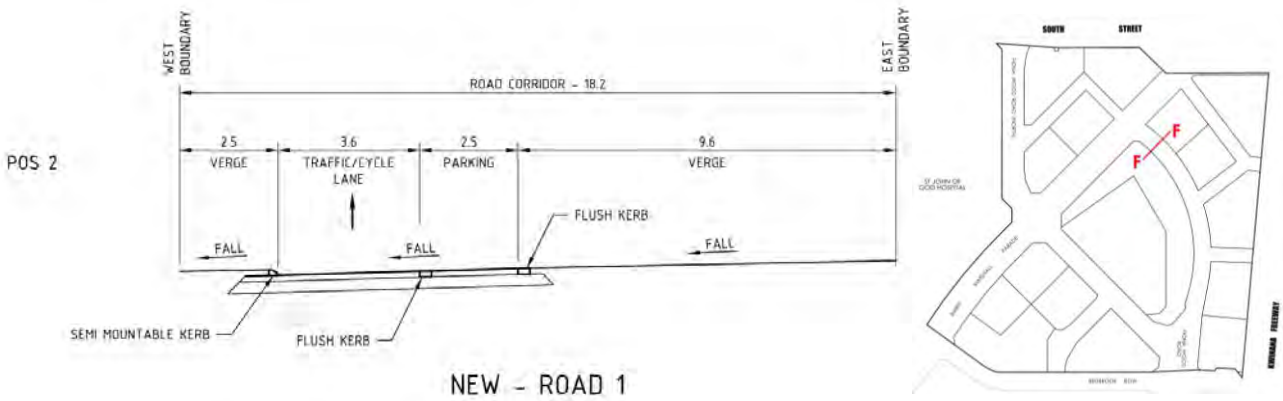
Section F-F Murdoch Boulevard (Road 1) North
